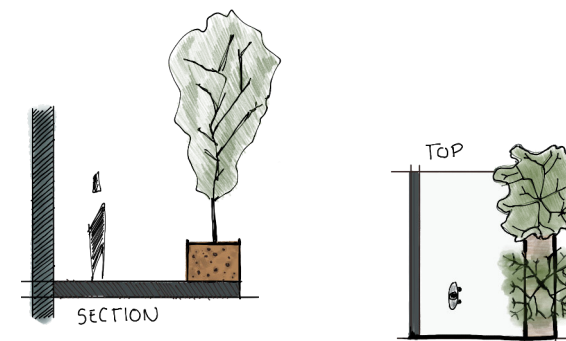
Sketch of the balconies of the Vertical Forest Section and Top view.
